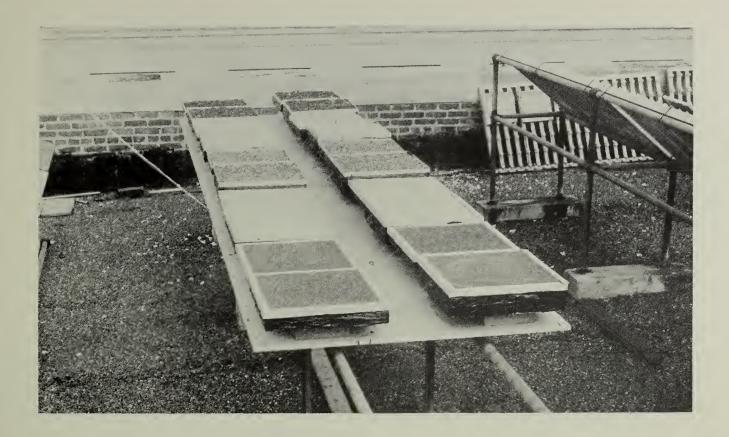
ROOF EXPOSURES OF BUILT-UP ROOF SPECIMENS.
